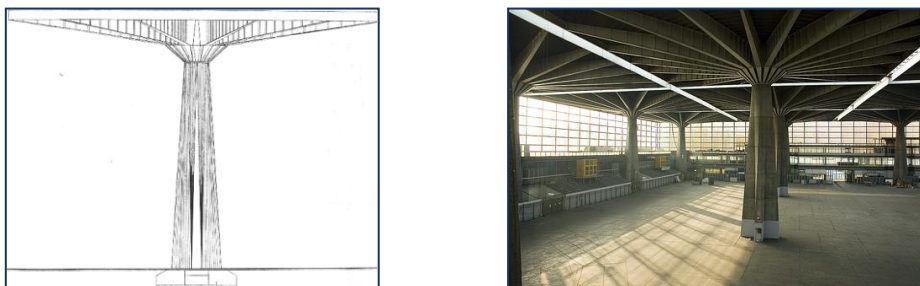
Elevation design drawing and view of a mushroom steel roof panel and the supporting R/C column
